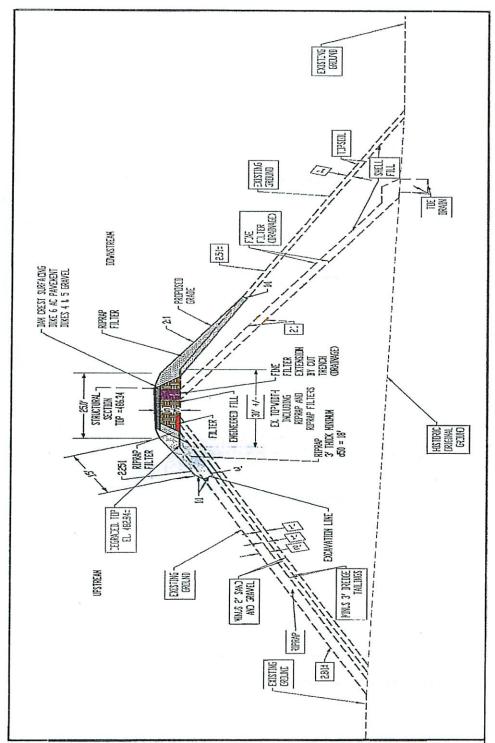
Preliminary typical cross section for 3.5-foot raise at Dikes 4, 5, and 6.
